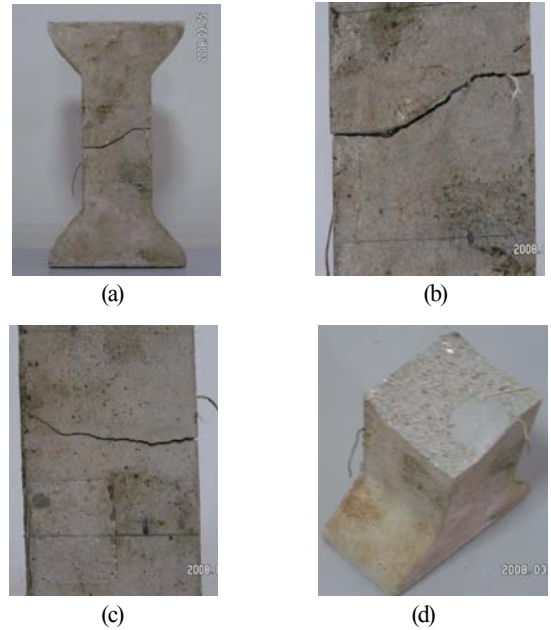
Failure states of sample with  $\alpha=60^\circ$ . (a): Fractured sample; (b): Fracture trace on front surface; (c): Fracture trace on back surface; (d): Fracture section
